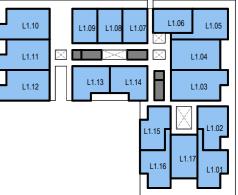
INDICATIVE CONCEPT APARTMENT LAYOUT - CROSS VENTILATION (NOT TO SCALE)
